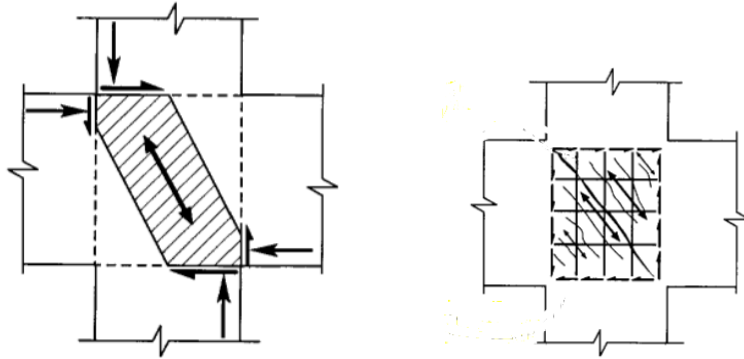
Concrete diagonal compression strut mechanism and truss mechanism
